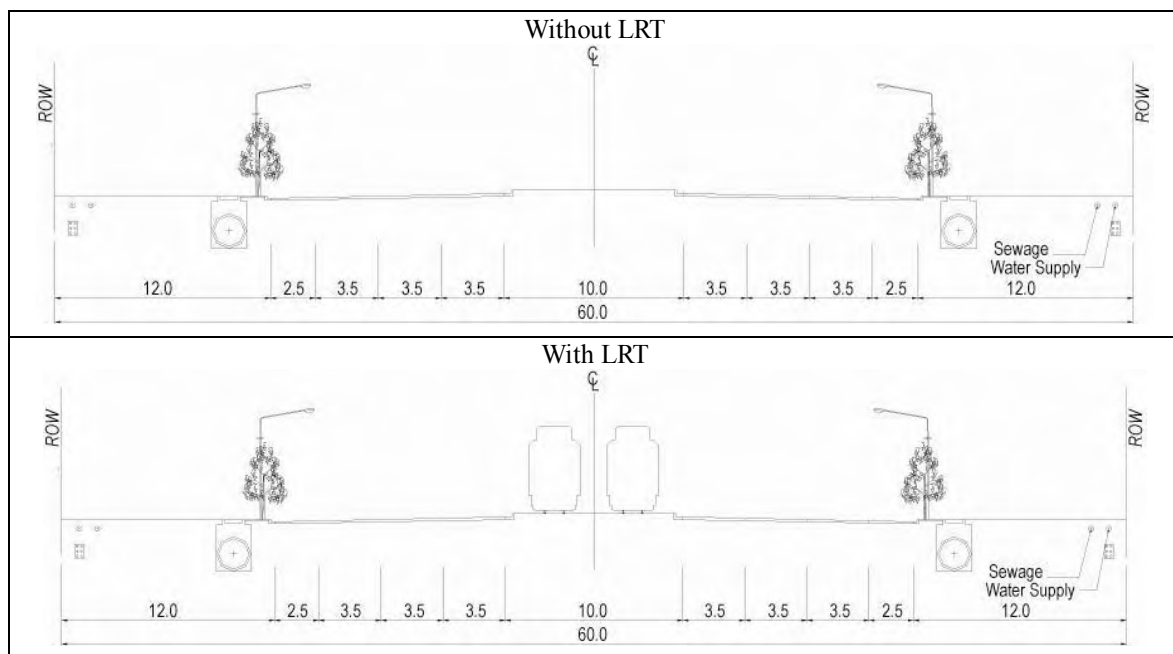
Typical Cross-section of a Primary Road (Type A: ROW = 60m)
